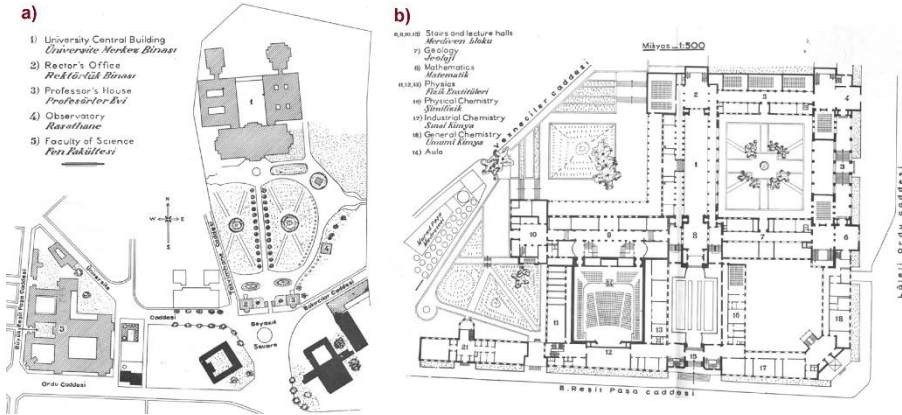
The site plan and floor plan of the building used for the symposium held at Istanbul University in 1952, a) site plan, b) floor plan (Günergun & Kadioğlu, 2006).
